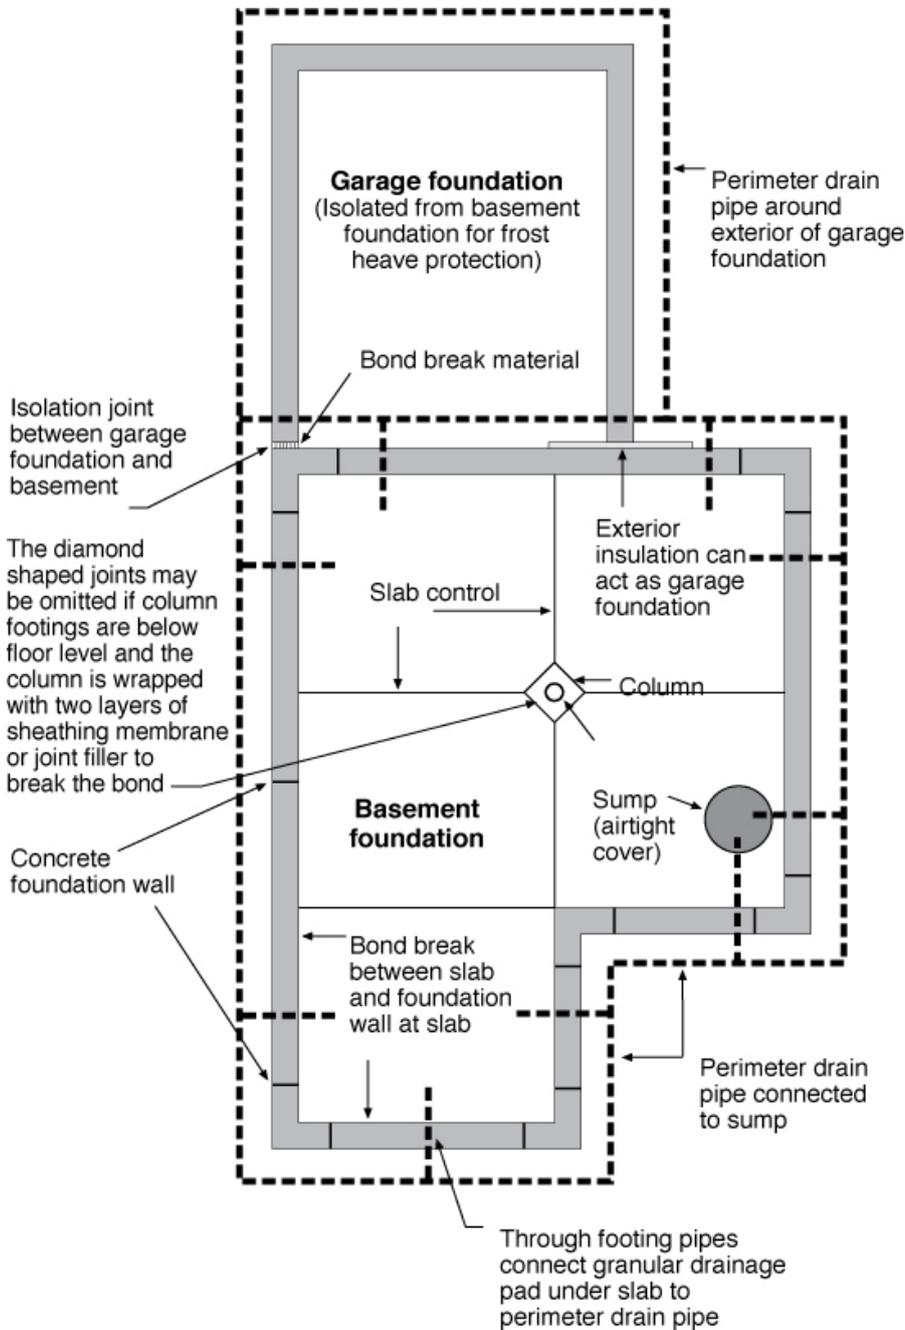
Basement plan showing sump pump location and perimeter drain that empties to the sump pit. (Image courtesy of [BSC](#))
